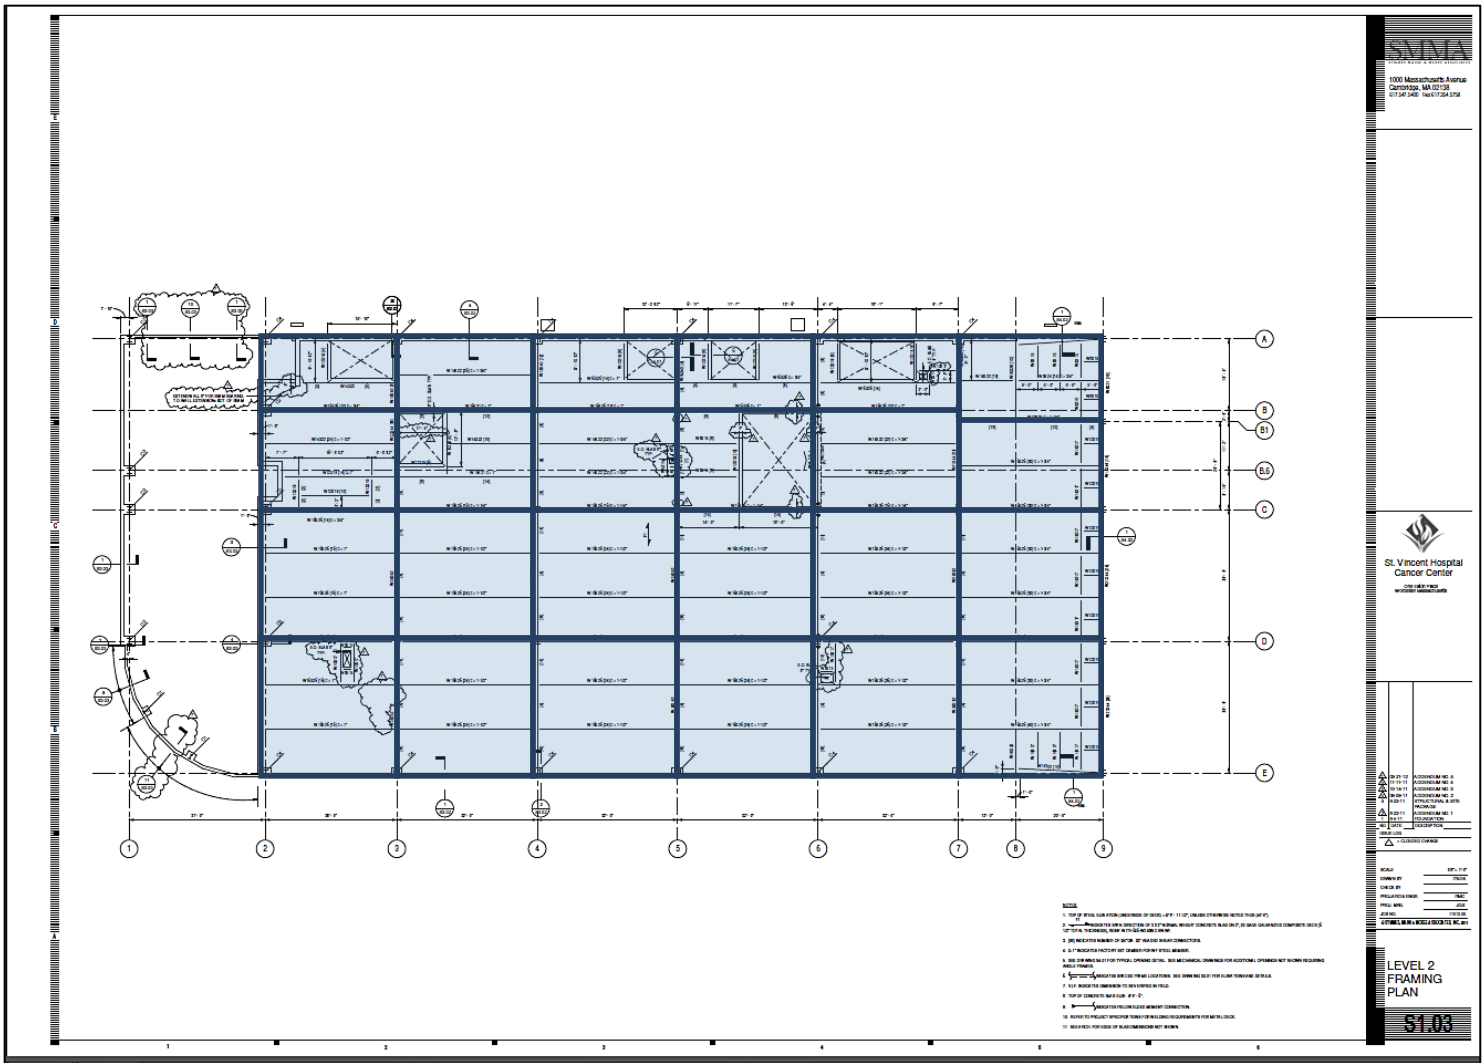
Example of SMMA Structural Design Drawing (S1.03 Level 2 Framing Plan)
